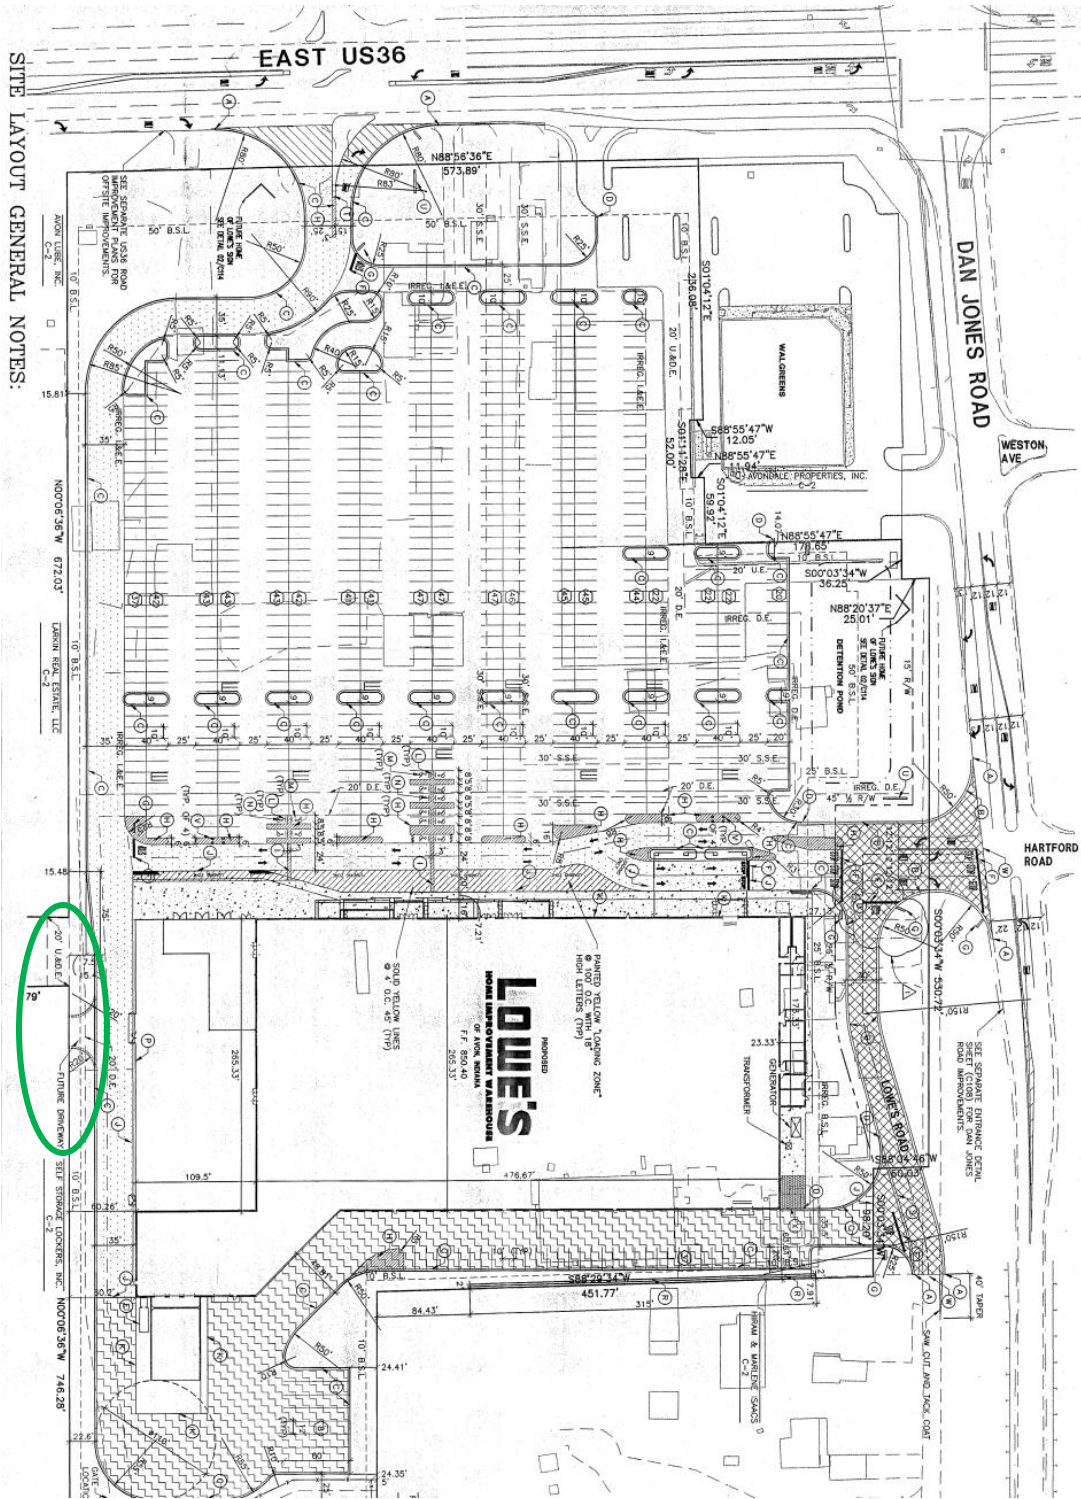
### Exhibit F – Site Plan Approved with SPR(A) 00-25
